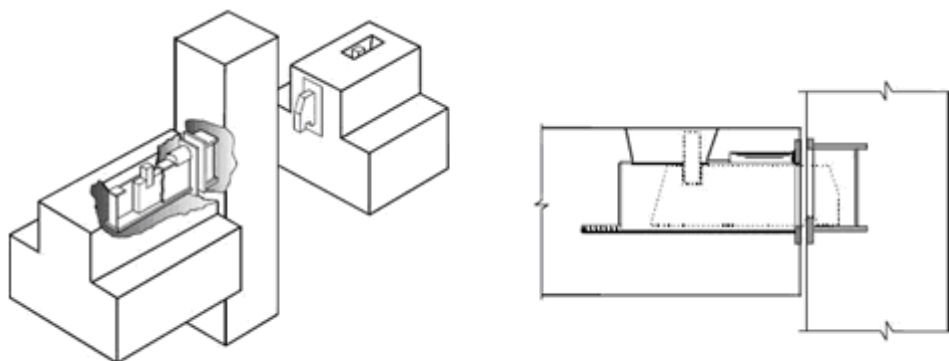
Movable steel plate connecting a beam to a column, published in fib (2007).
